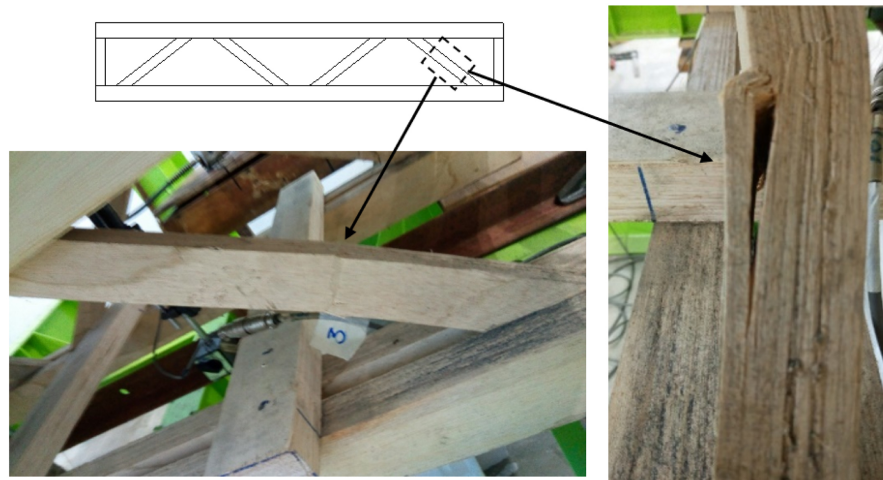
Failure mode of the conventional composite floor (CCF) specimen.
